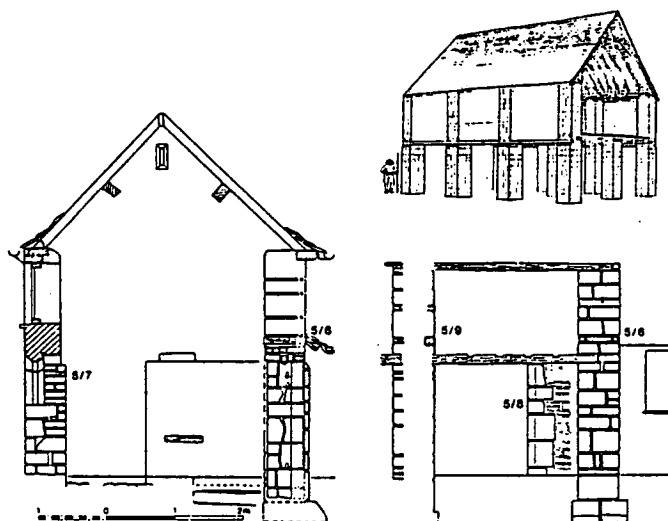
Shipton-under-Wychwood: Prebendal House. The 'Romanesque' building; left, internal elevation of north wall; right external elevation of north wall; above, a reconstruction of the early 13th century granary
